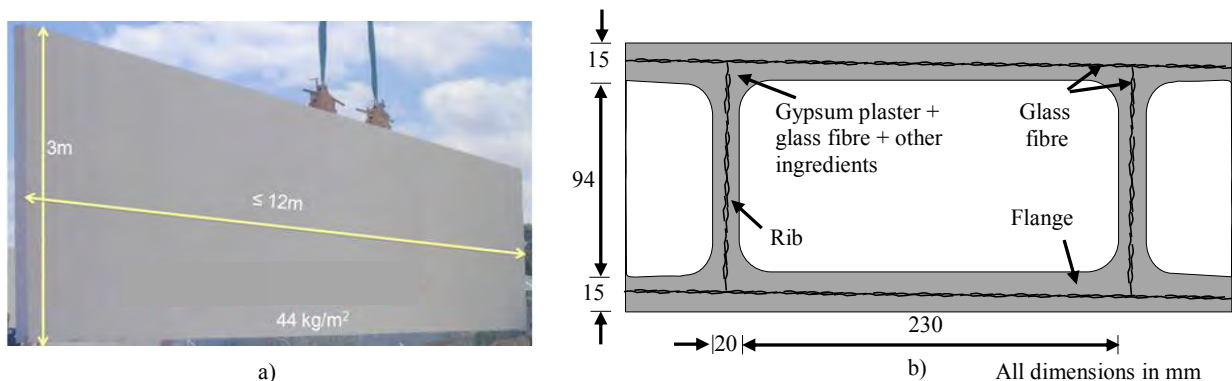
GFRG panel: a) Elevation, b) Cross-section
